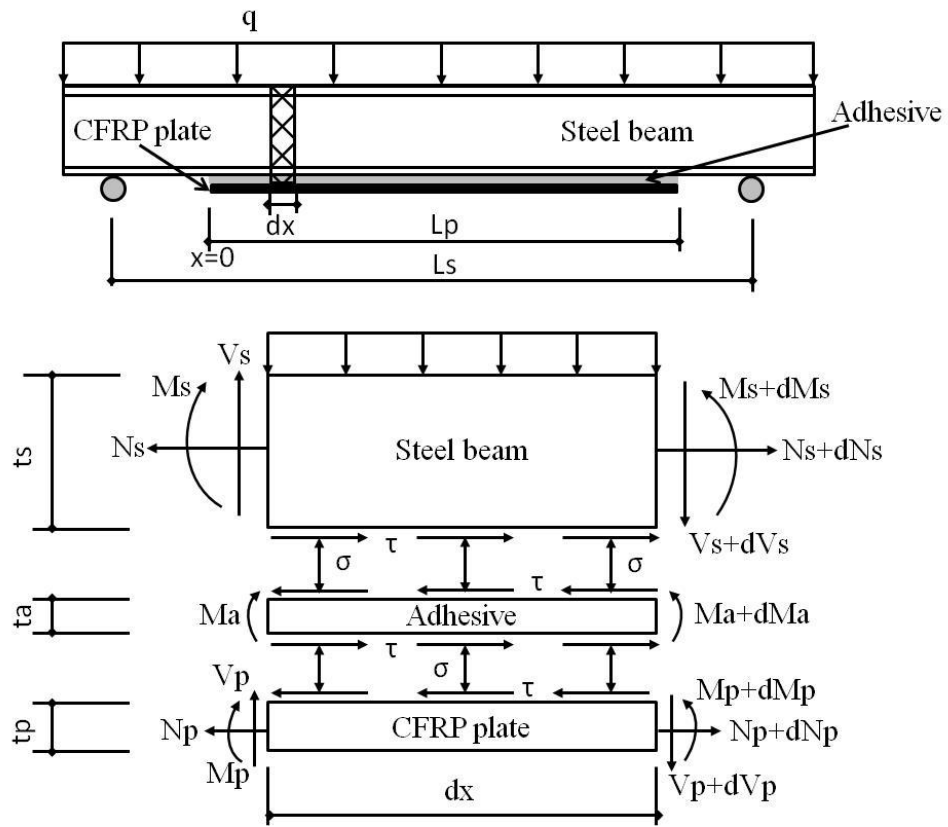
Geometry and definition of the strengthened beam and a segmental element of length dx
